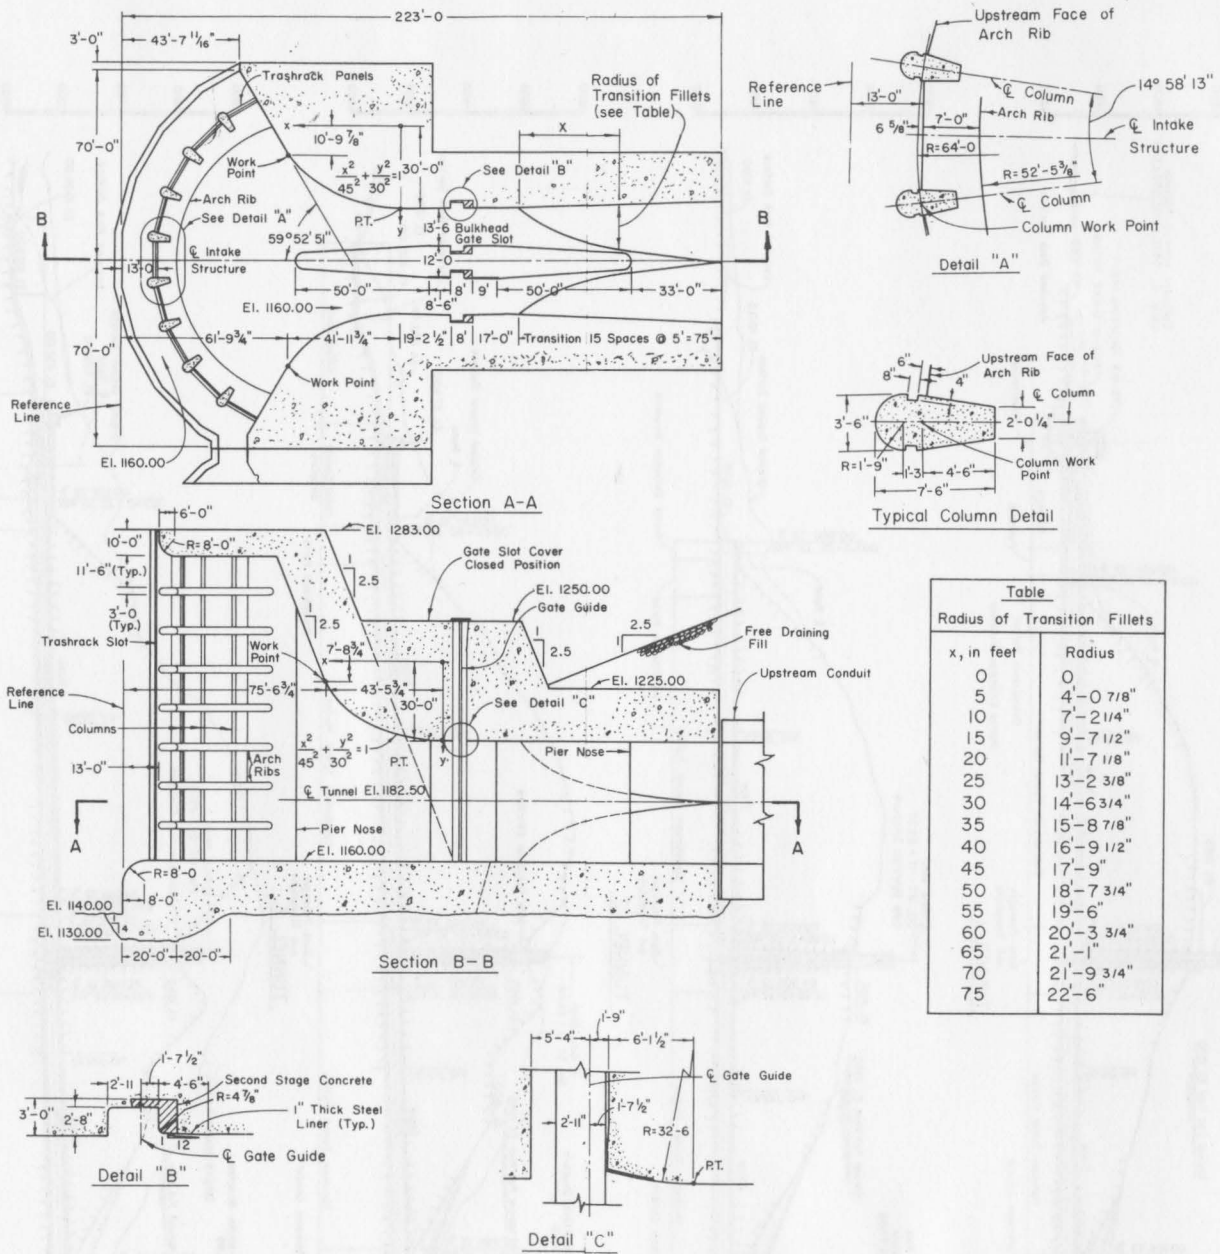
Details of inlet structures for Tunnels 3 and 4.
